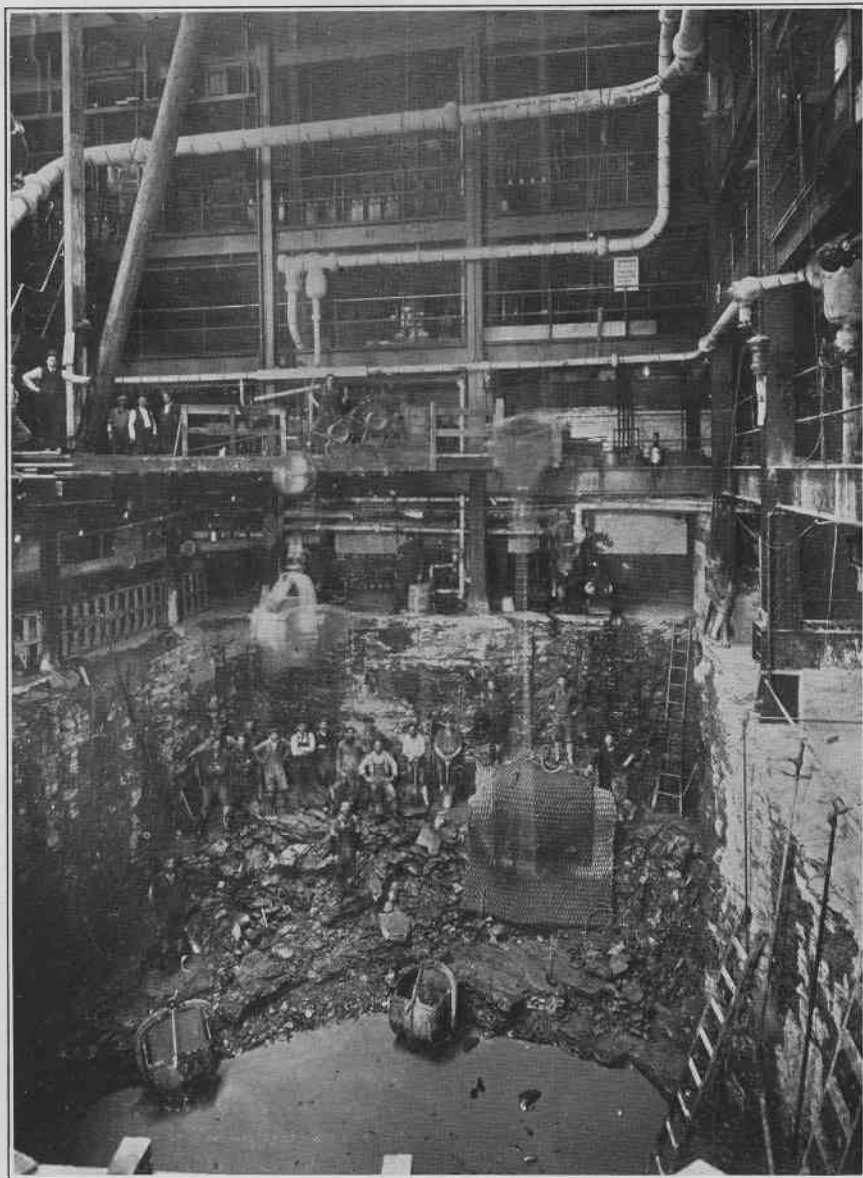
Excavating Foundation Pits for New Turbines at Station 3.
